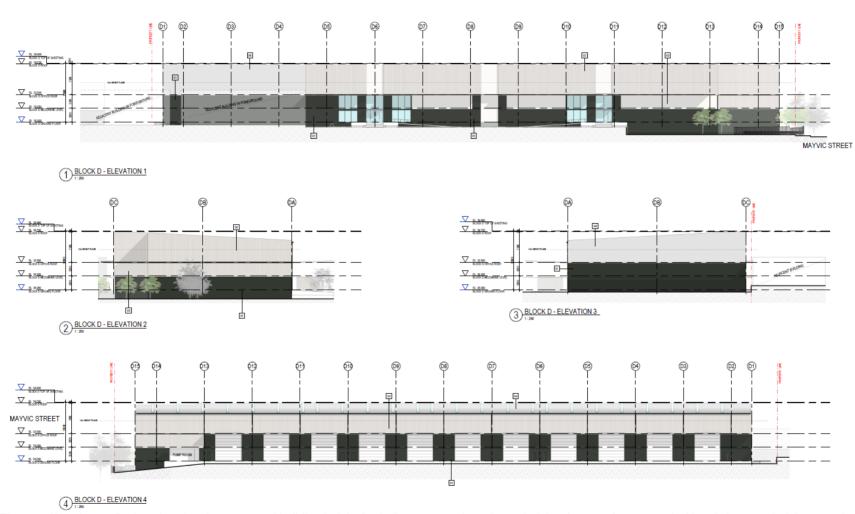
Warehouse D elevation showing proposed building height (including proposed maximum height of 17.75m) compared with existing 12m height control (Source: Group GSA)
